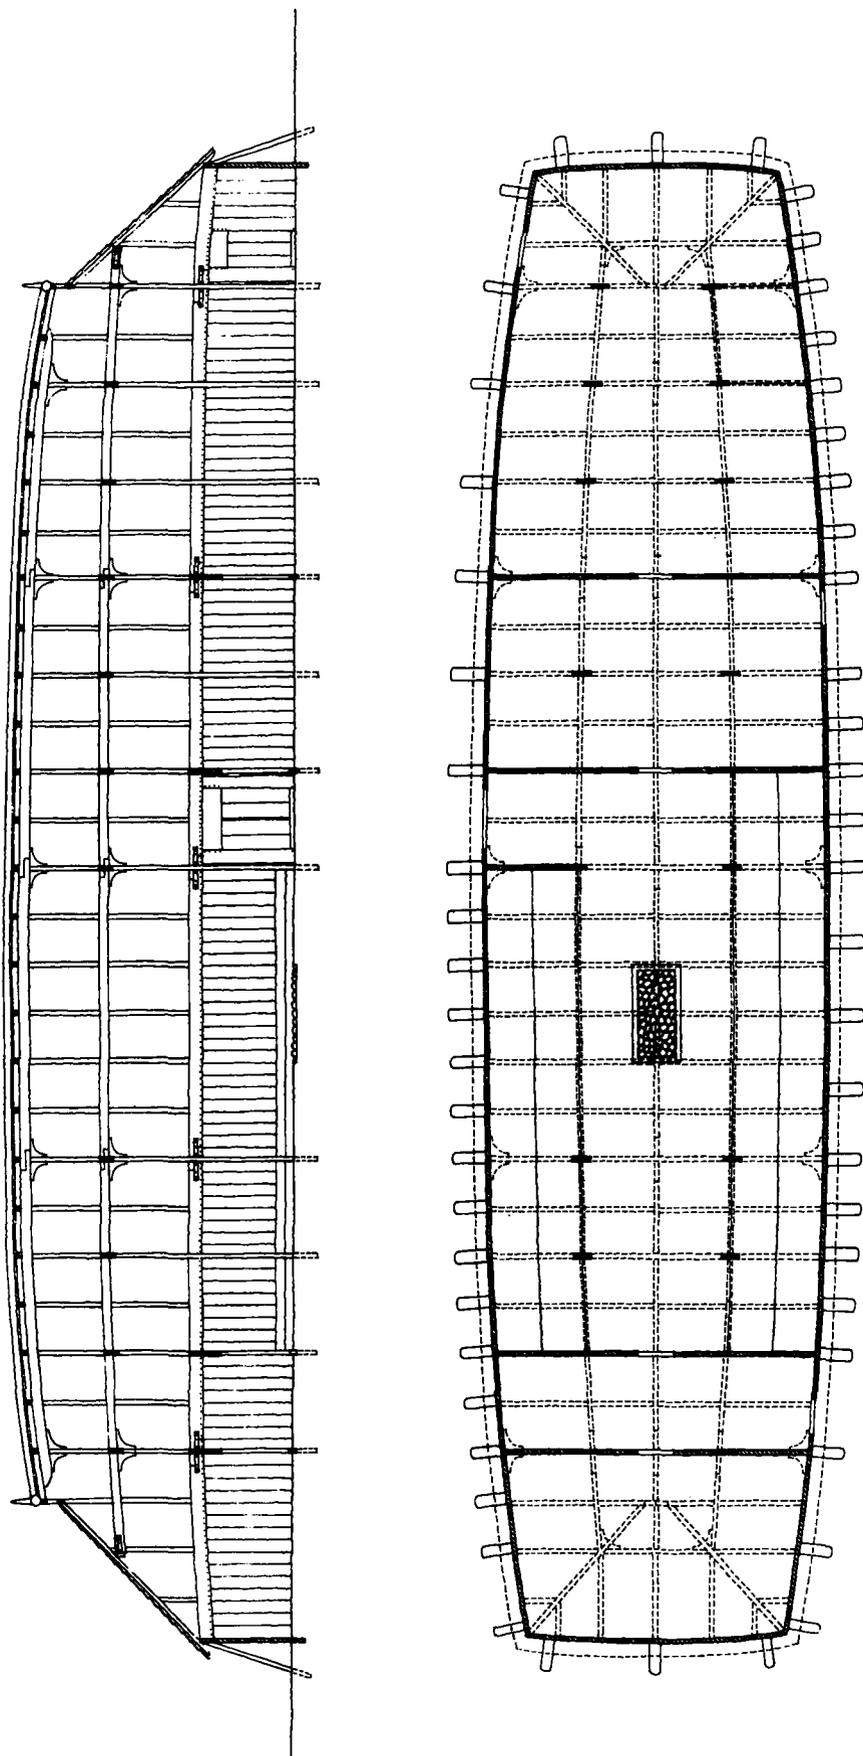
Reconstruction of the Lejre hall. Plan, section and elevation, scale 1:250. H.S. 1991.
